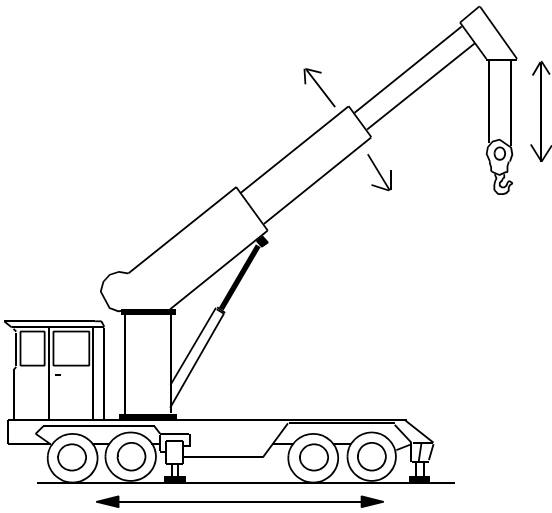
Commercial truck-mounted crane -- telescoping boom.
